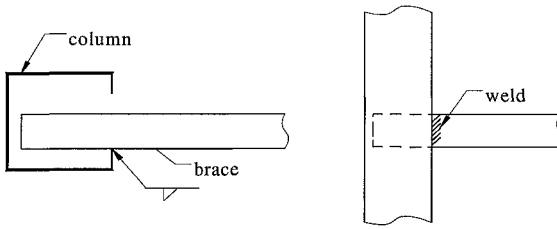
Joint Detail Ineffective in Resisting Post Twisting
